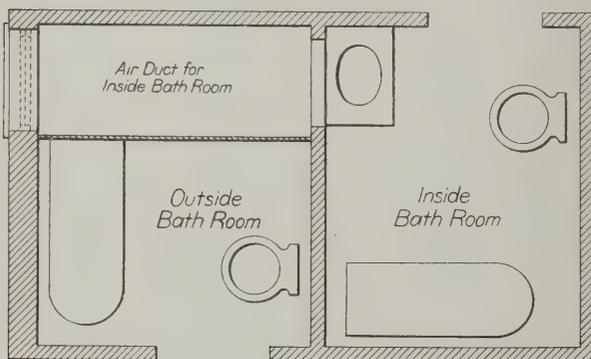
Plan of Bath Rooms, Showing Ventilating Duct
